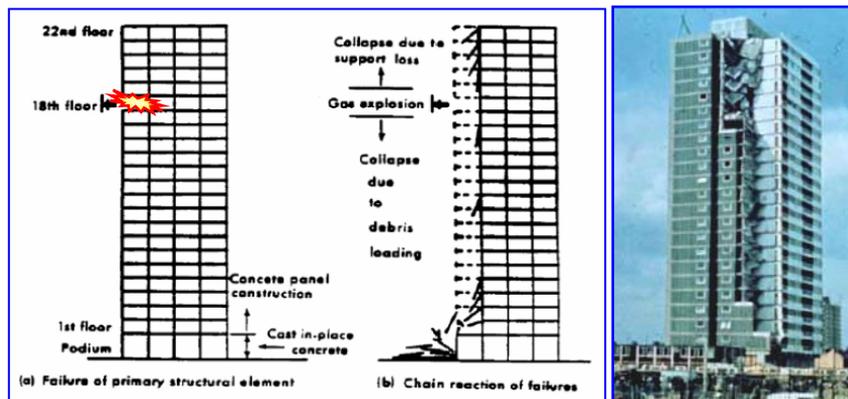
Ronan Point: Schematic of Collapse, and Photograph.
